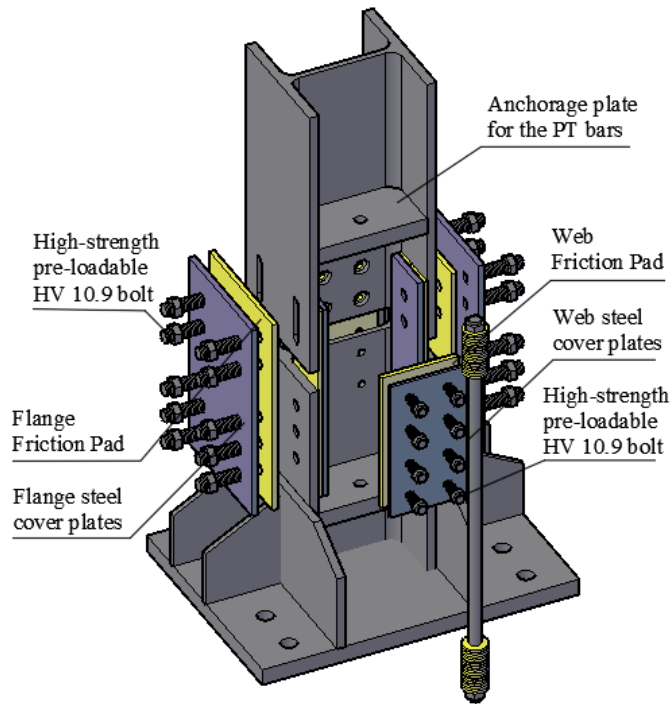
3D exploded view of the Damage-Free Self-Centring Column Base (SC-CB) [1]
